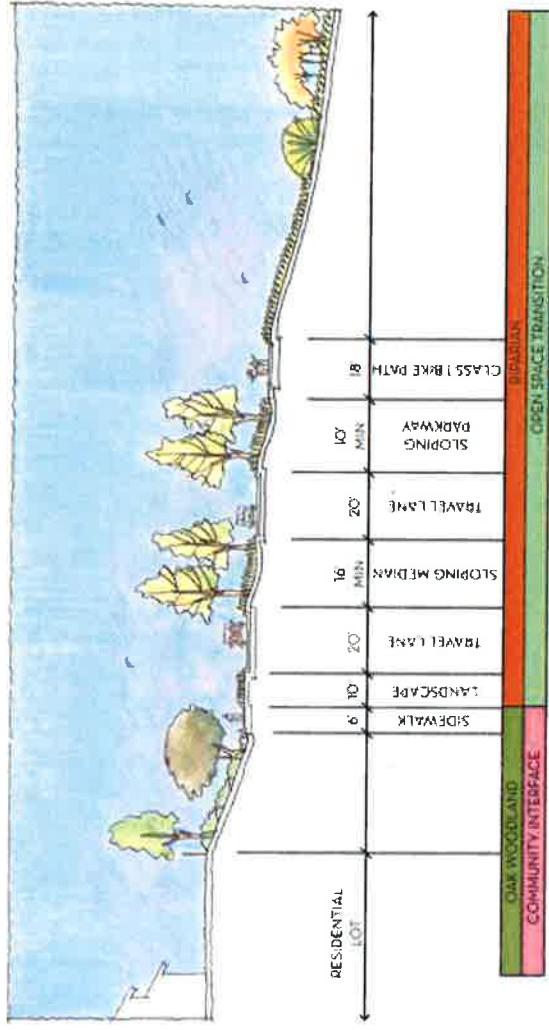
Easton Valley Loop Road Landscape - Oak Savannah Zone
